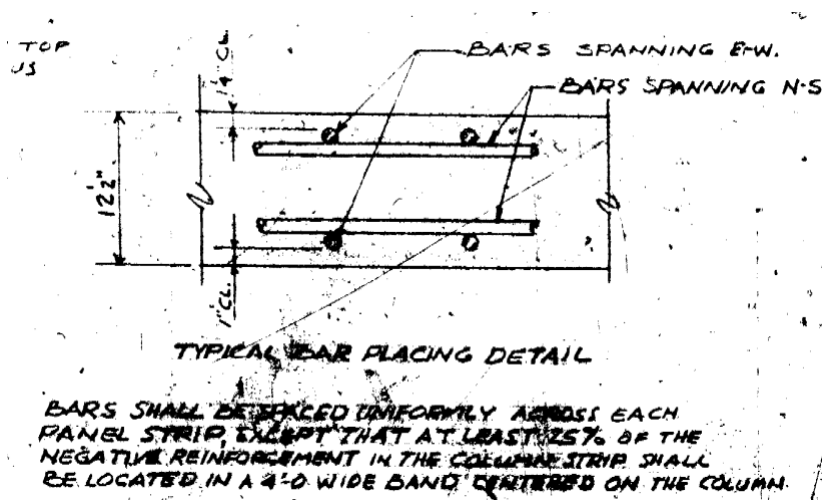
Typical slab reinforcing bar placement detail in the two-way flat slabs at the parking structure (excerpt from the original design drawing S8)
